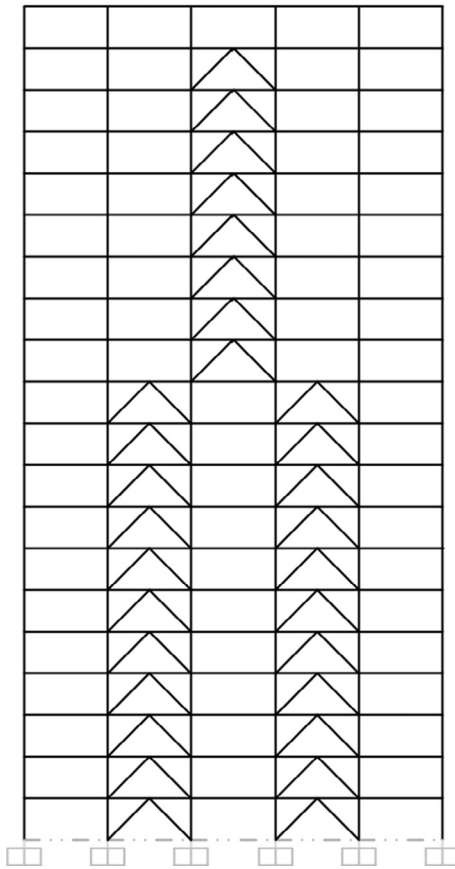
Elevation view of the 20-story building in Y direction.
